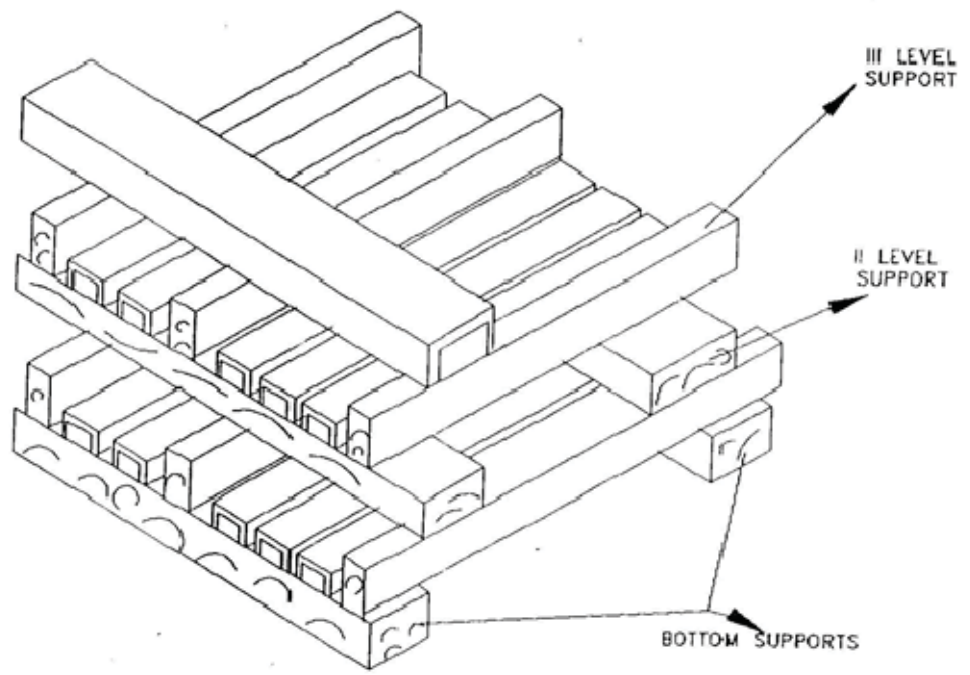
STRUCTURAL STEEL STACKING ARRANGEMENT
